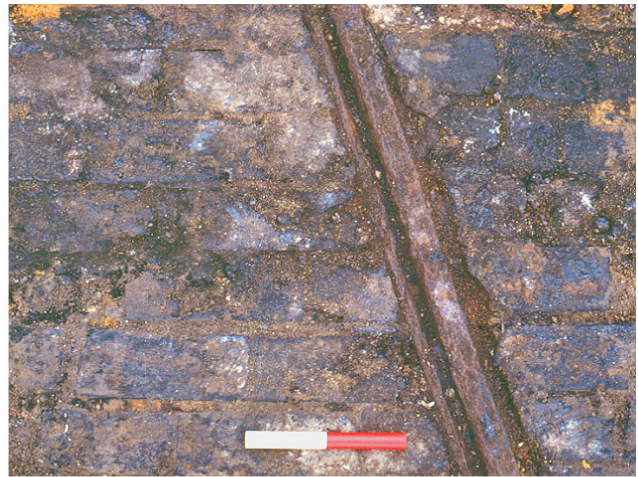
The surface over the Engine Room, showing detail of the base for an original (?temporary) building. This was constructed from two angled girders riveted to the roof, and would probably have supported a timber superstructure.
